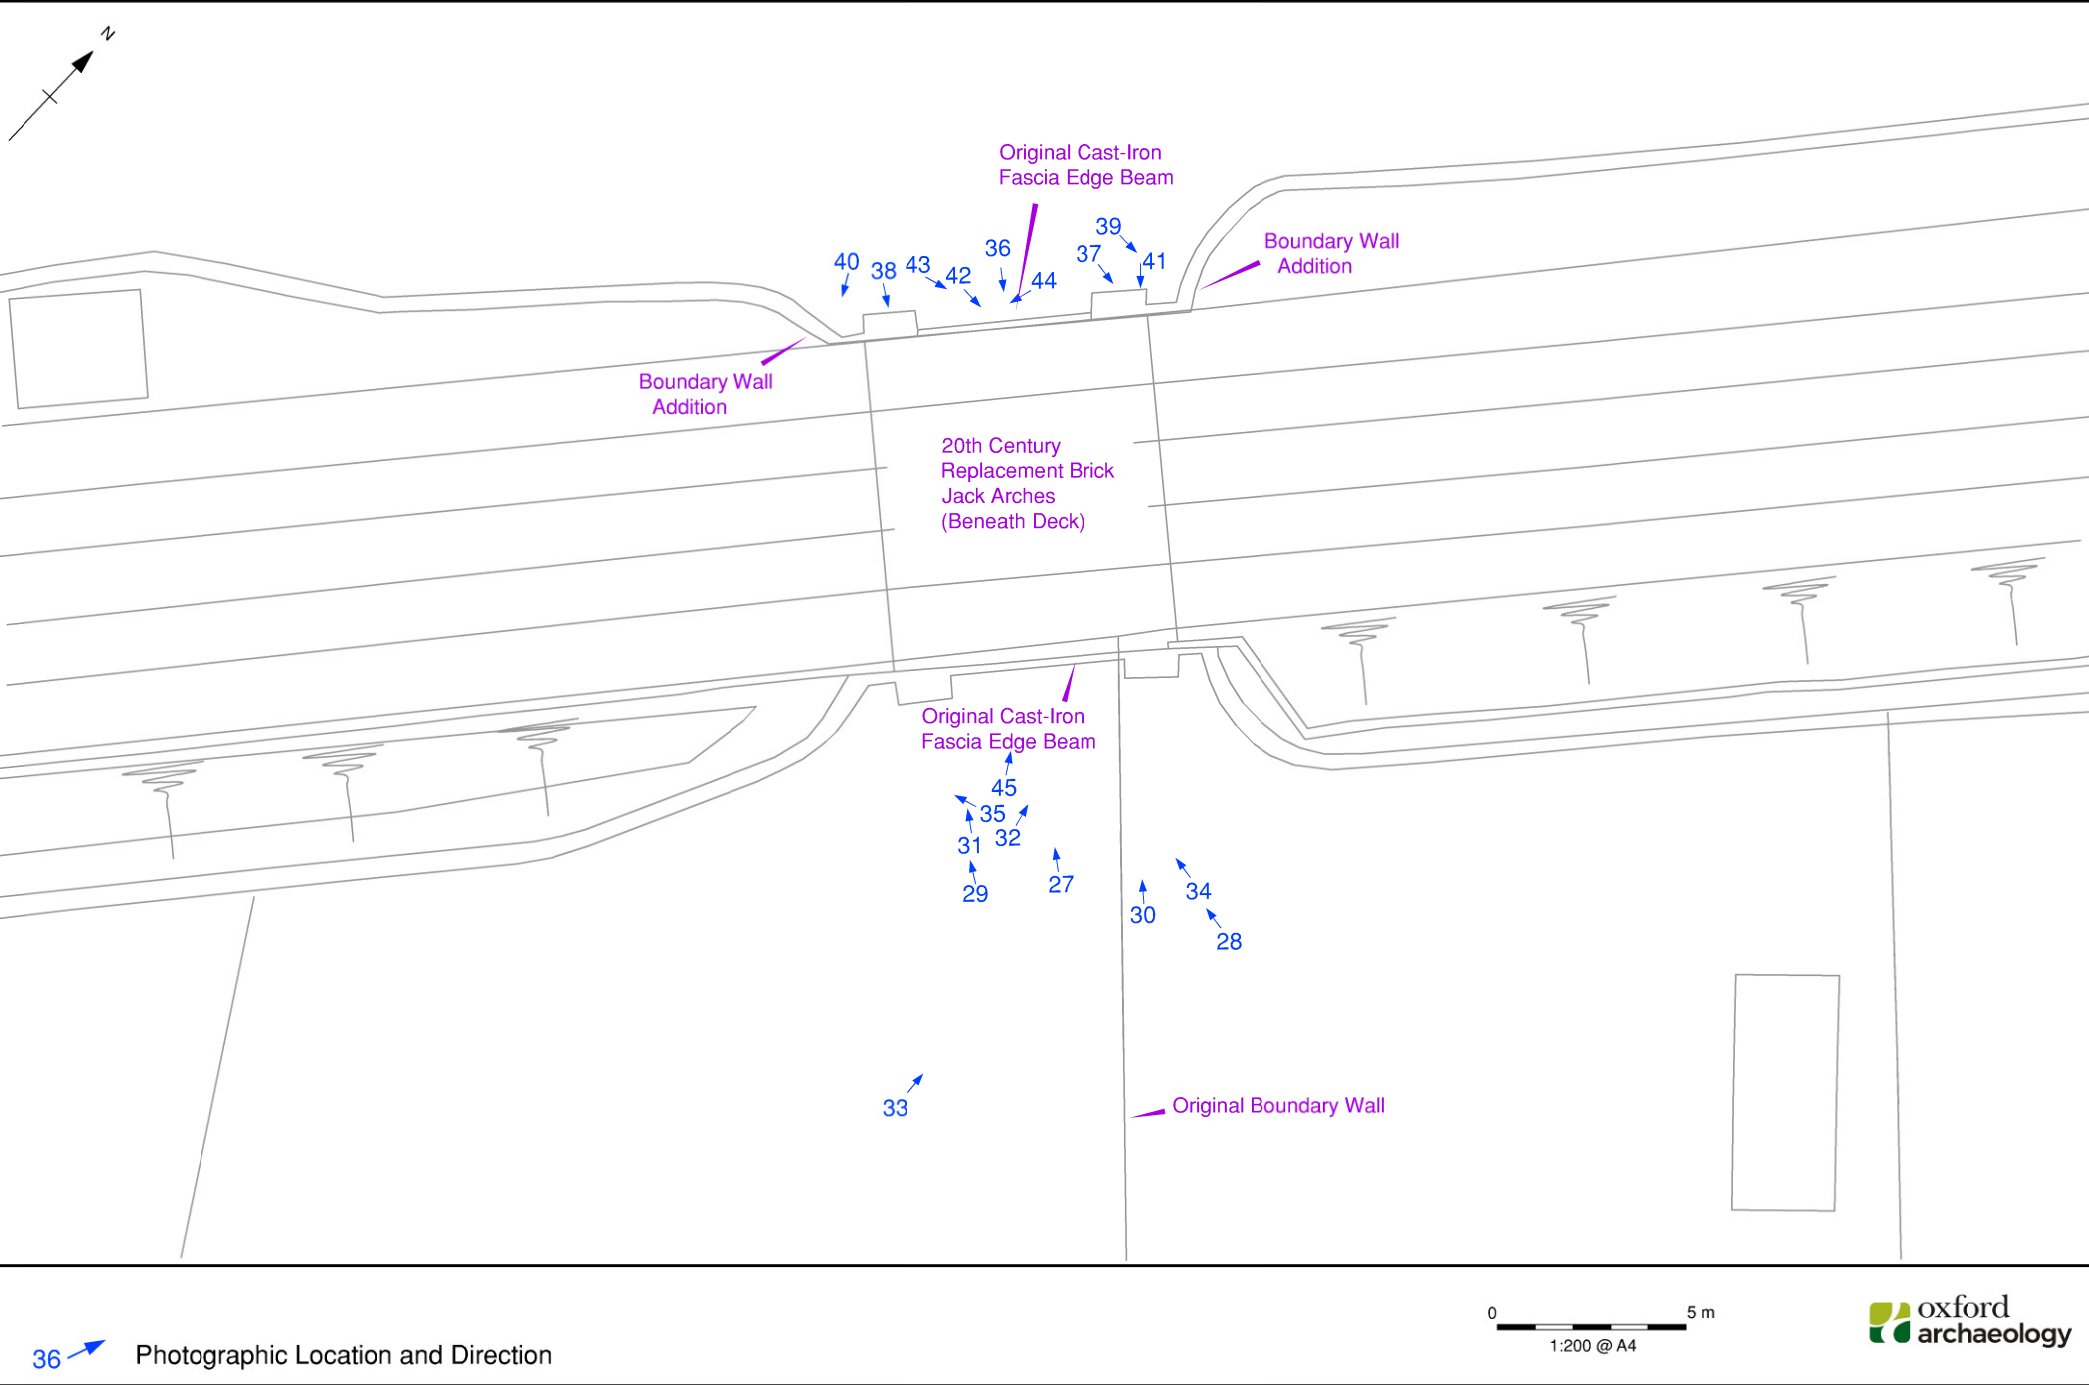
Ming Hill Underbridge (MDL1/14) photographic plan
